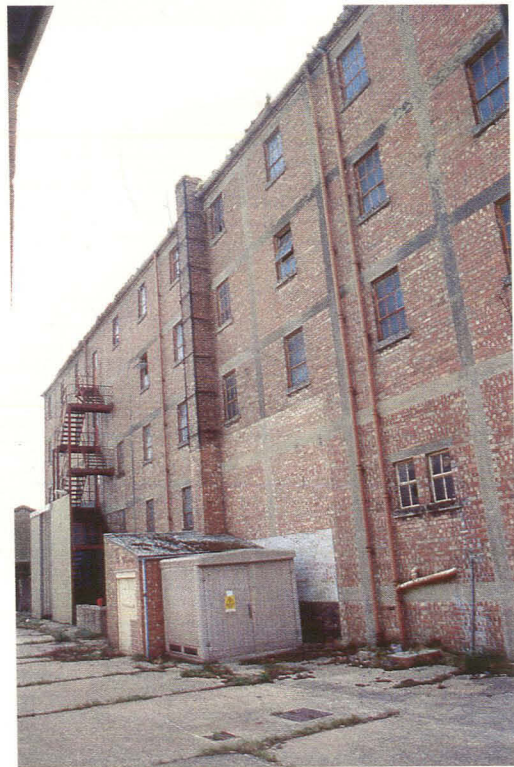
East elevation of Warehouse 1, showing electric sub-station, chimney with steel frame
